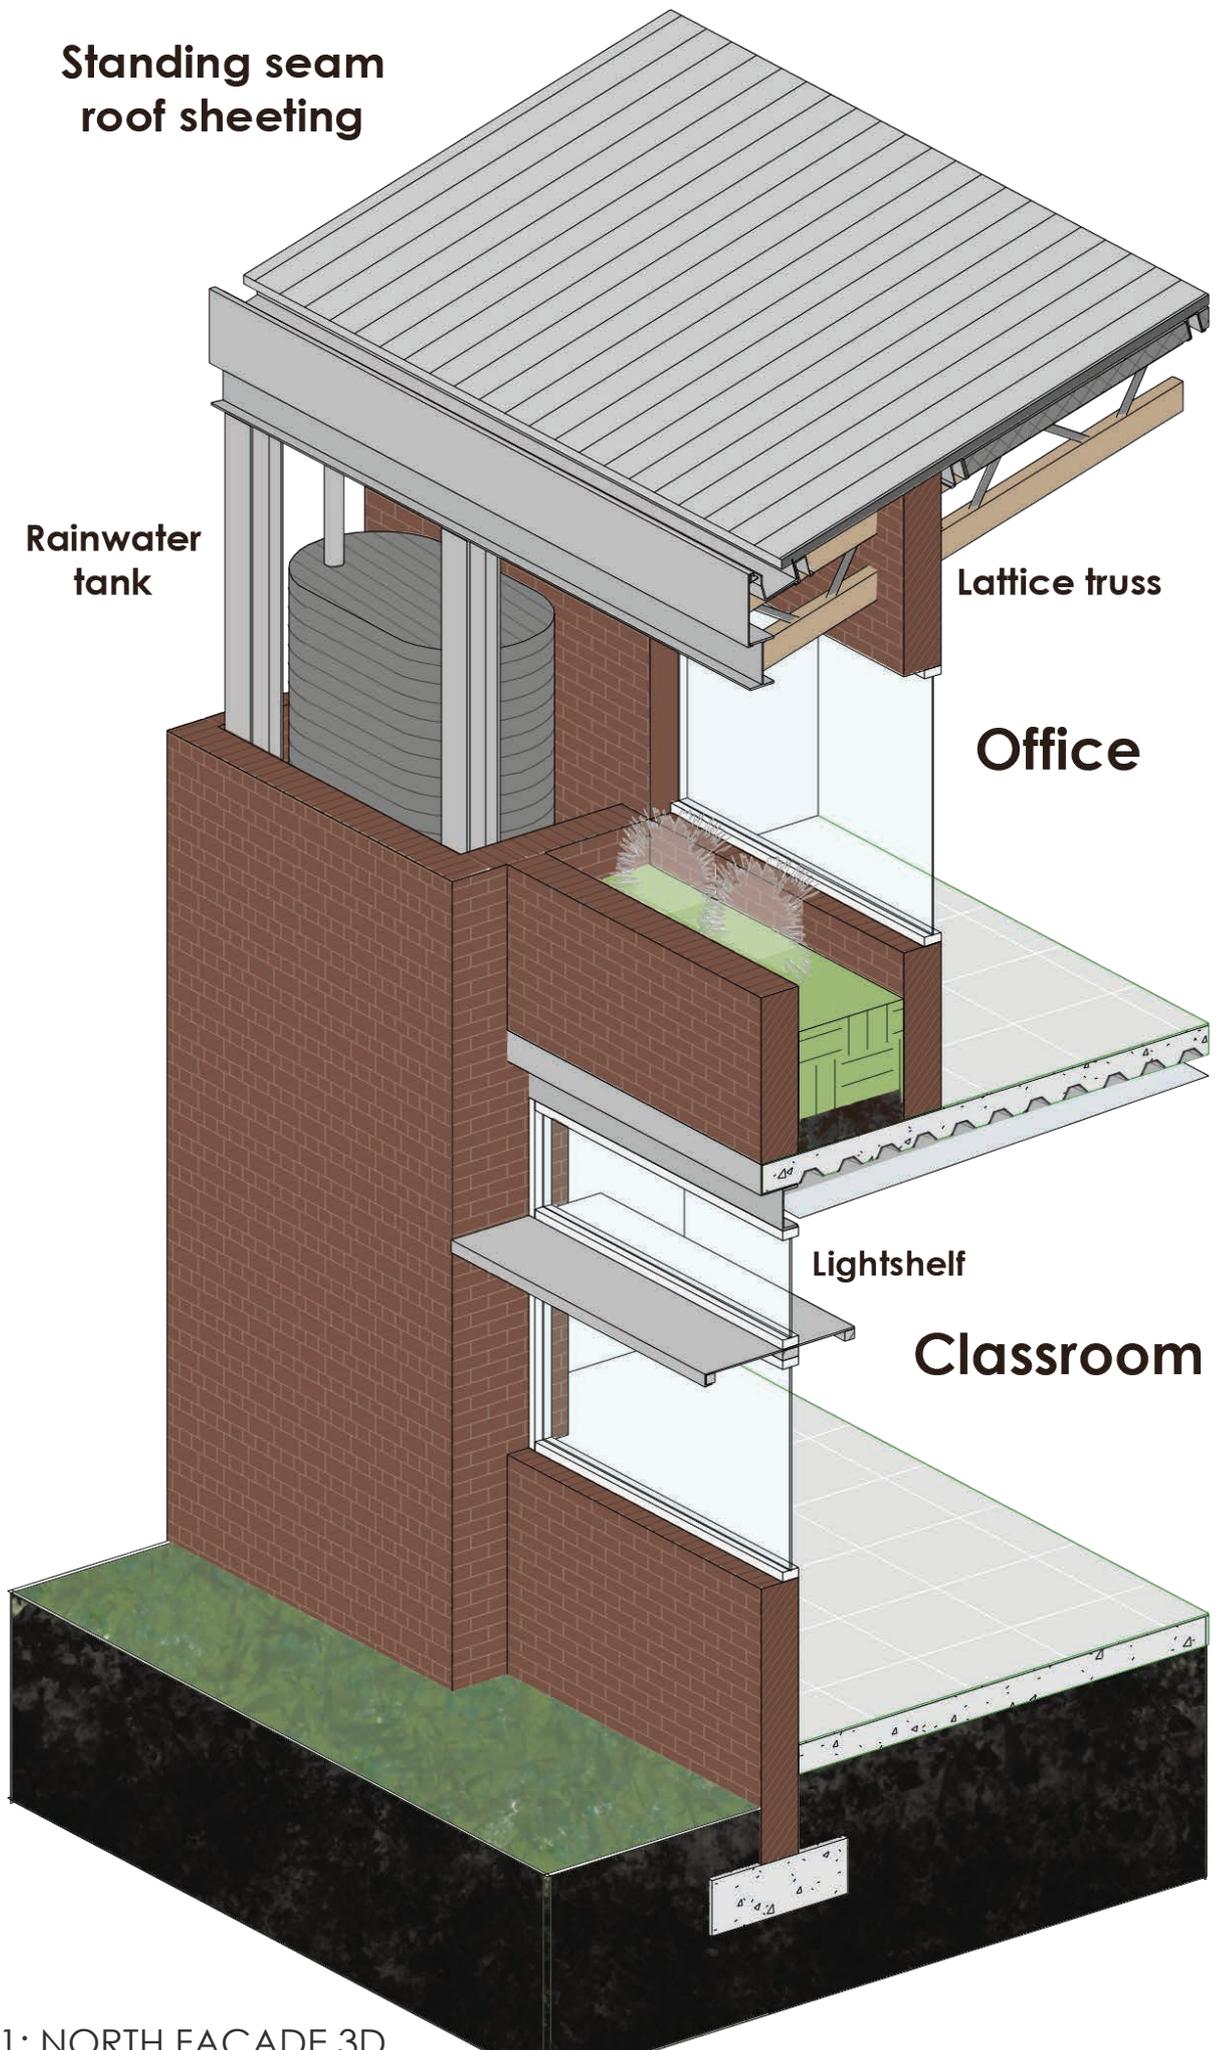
3D Section of brickwork around columns (Author, 2017)
